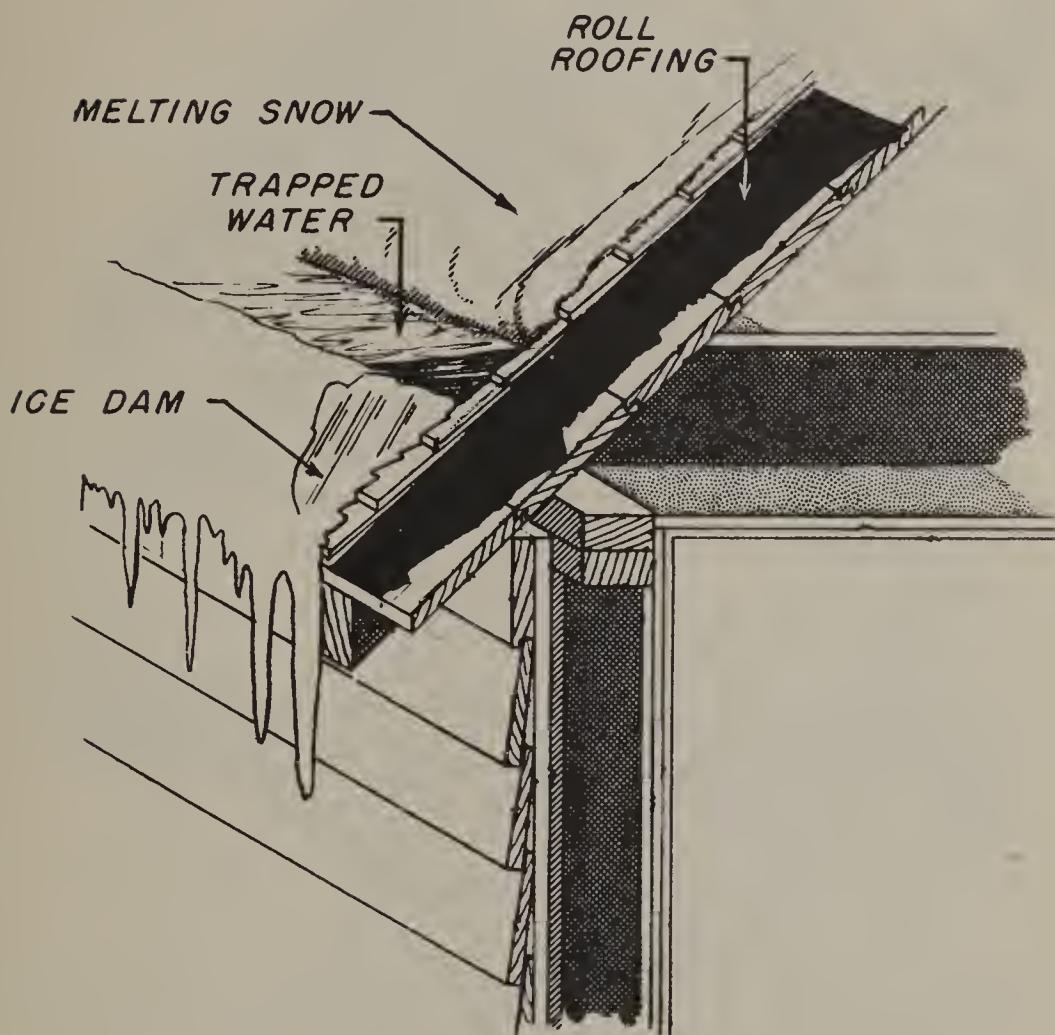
Eave protection, snow and ice dams.* The conditions producing snow and ice dams are indicated in figure 50. The simplest way of preventing such leakage of water is to lay a single course of heavy roofing felt over the eaves and extending upwards well above the inside line of the wall. Sheet metal could also be used as a lining material.
